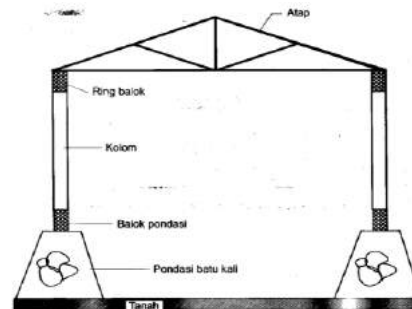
Picture frame construction. Consisting of foundation, Sloof or foundation bar, columns, ring bar, sopi-sopi bar, and the roof truss.
